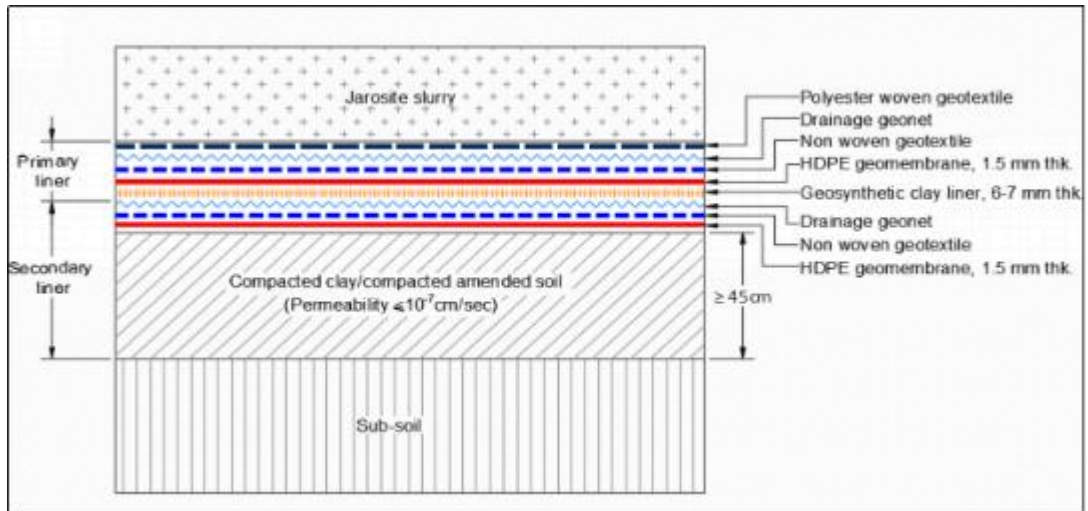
Typical cross section of side lining system of Vizag Jarosite pond
